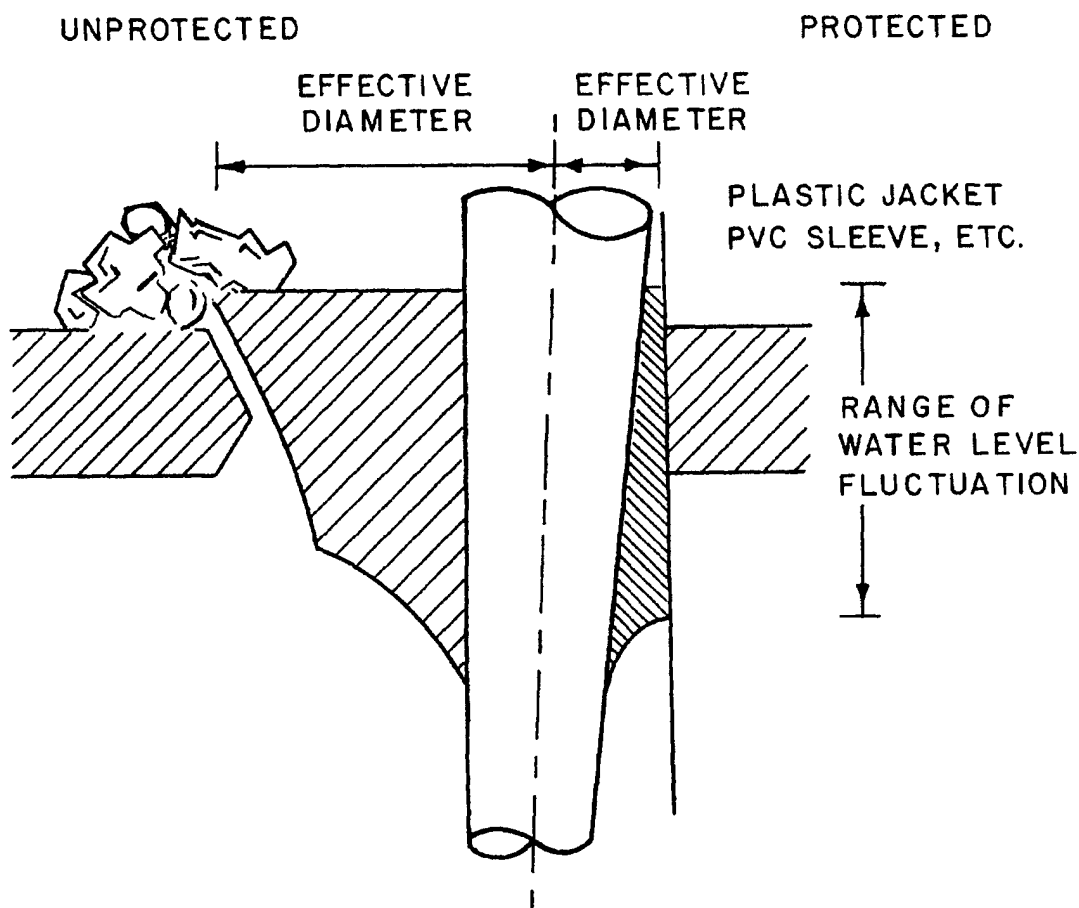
Typical pile driven (narrow end down) showing protection and nonprotection from ice.
